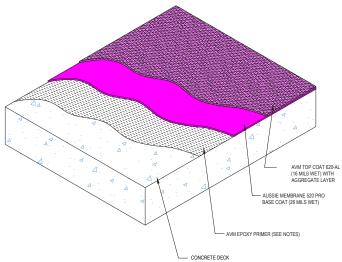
TYPICAL ASSEMBLY OVER CONCRETE
